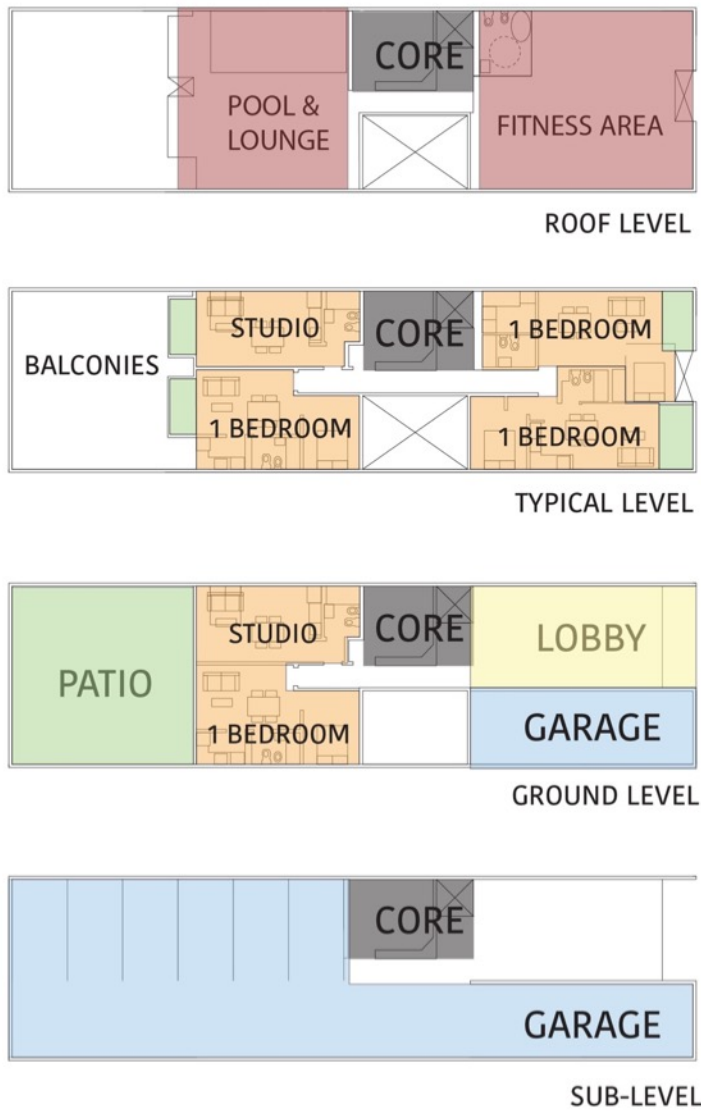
Possible Floor Layouts and Typical Plan (Author)
